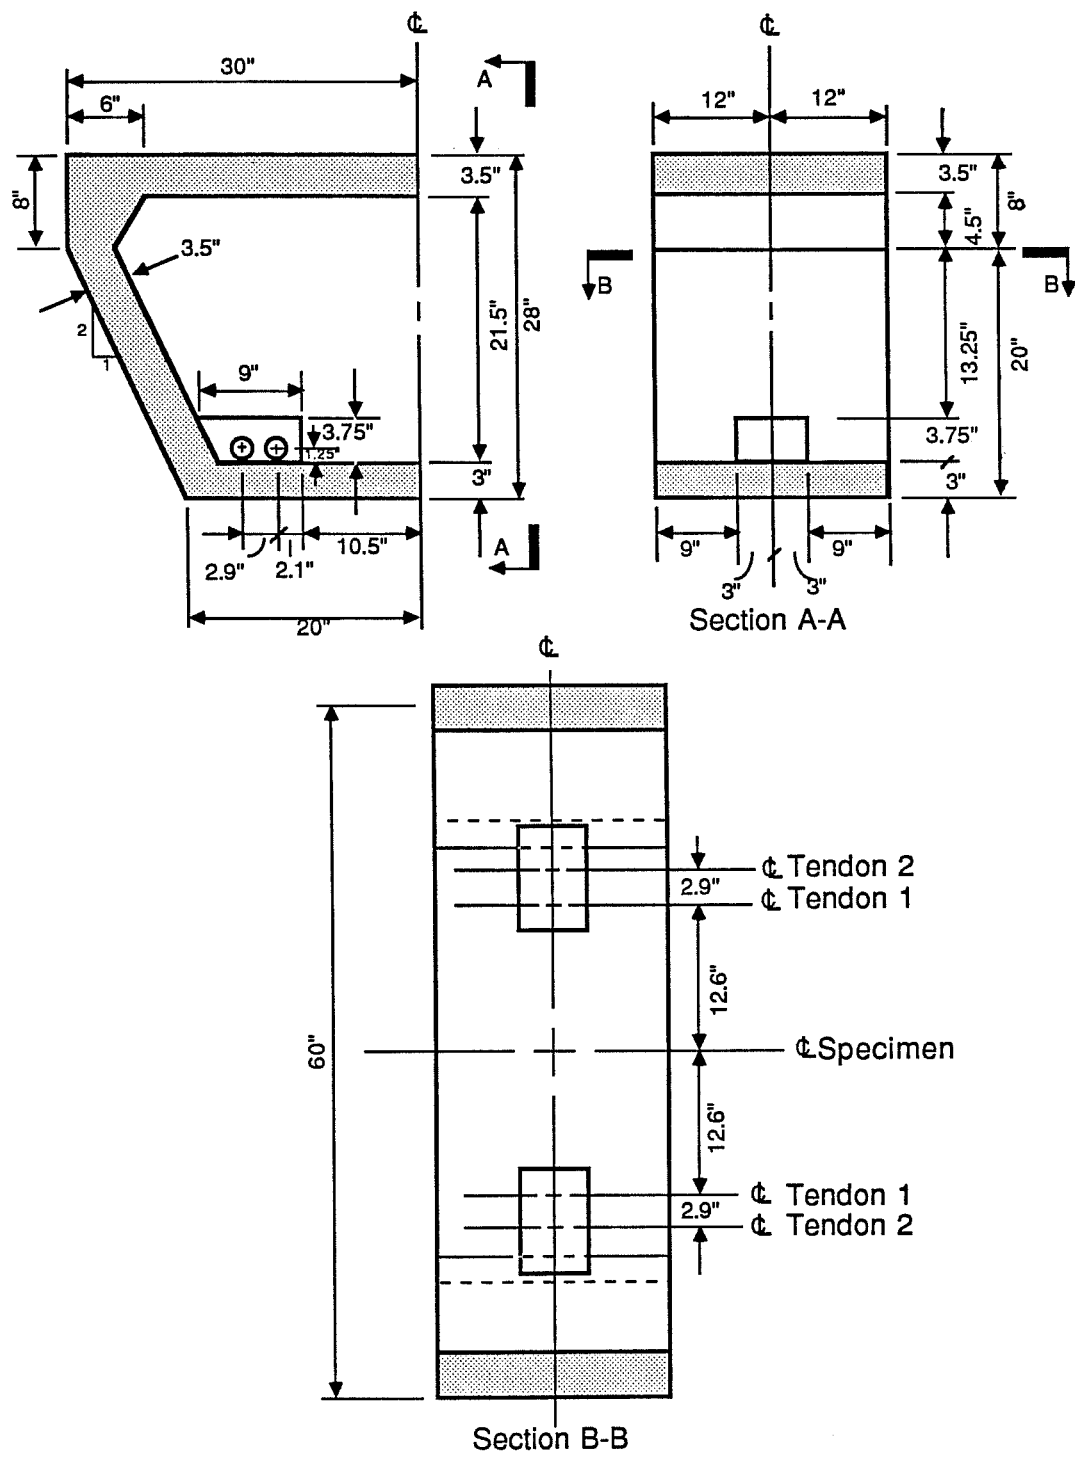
Specimens 4A, 4B, 5A, 5B Dimensions
